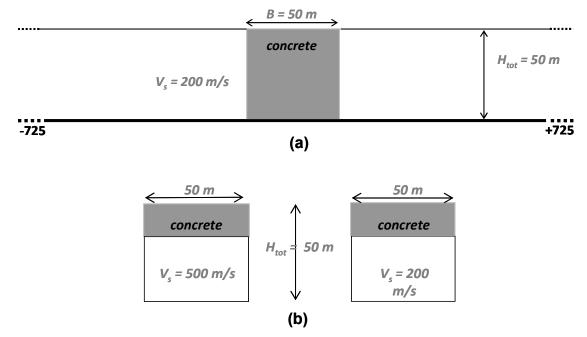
Evaluation of the influence of the grouted area using idealized models : (a) a "concrete column" resting on the bedrock, surrounded by non-jet-grouted soil ; (b) a model of total width equal to the foundation, containing jet-grouted soil, and a model of total width equal to the foundation, containing non-improved soil.
